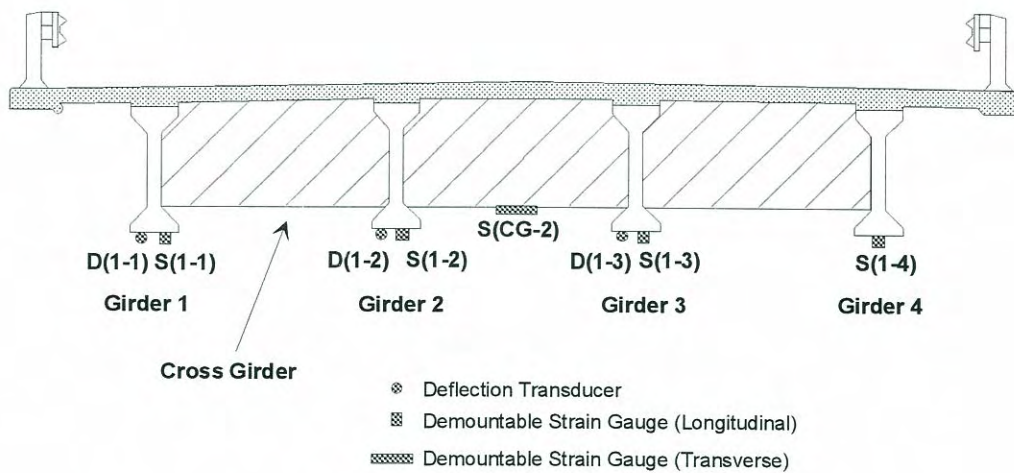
Cross section of bridge with instrumentation (looking north).
